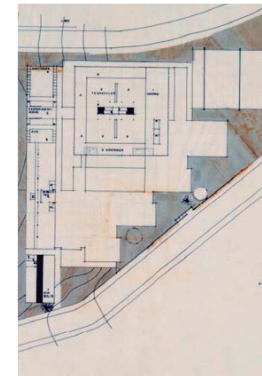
Floor plan of the Miljøsenster, Norwegian Institute of Technology, Trondheim, Norway.
